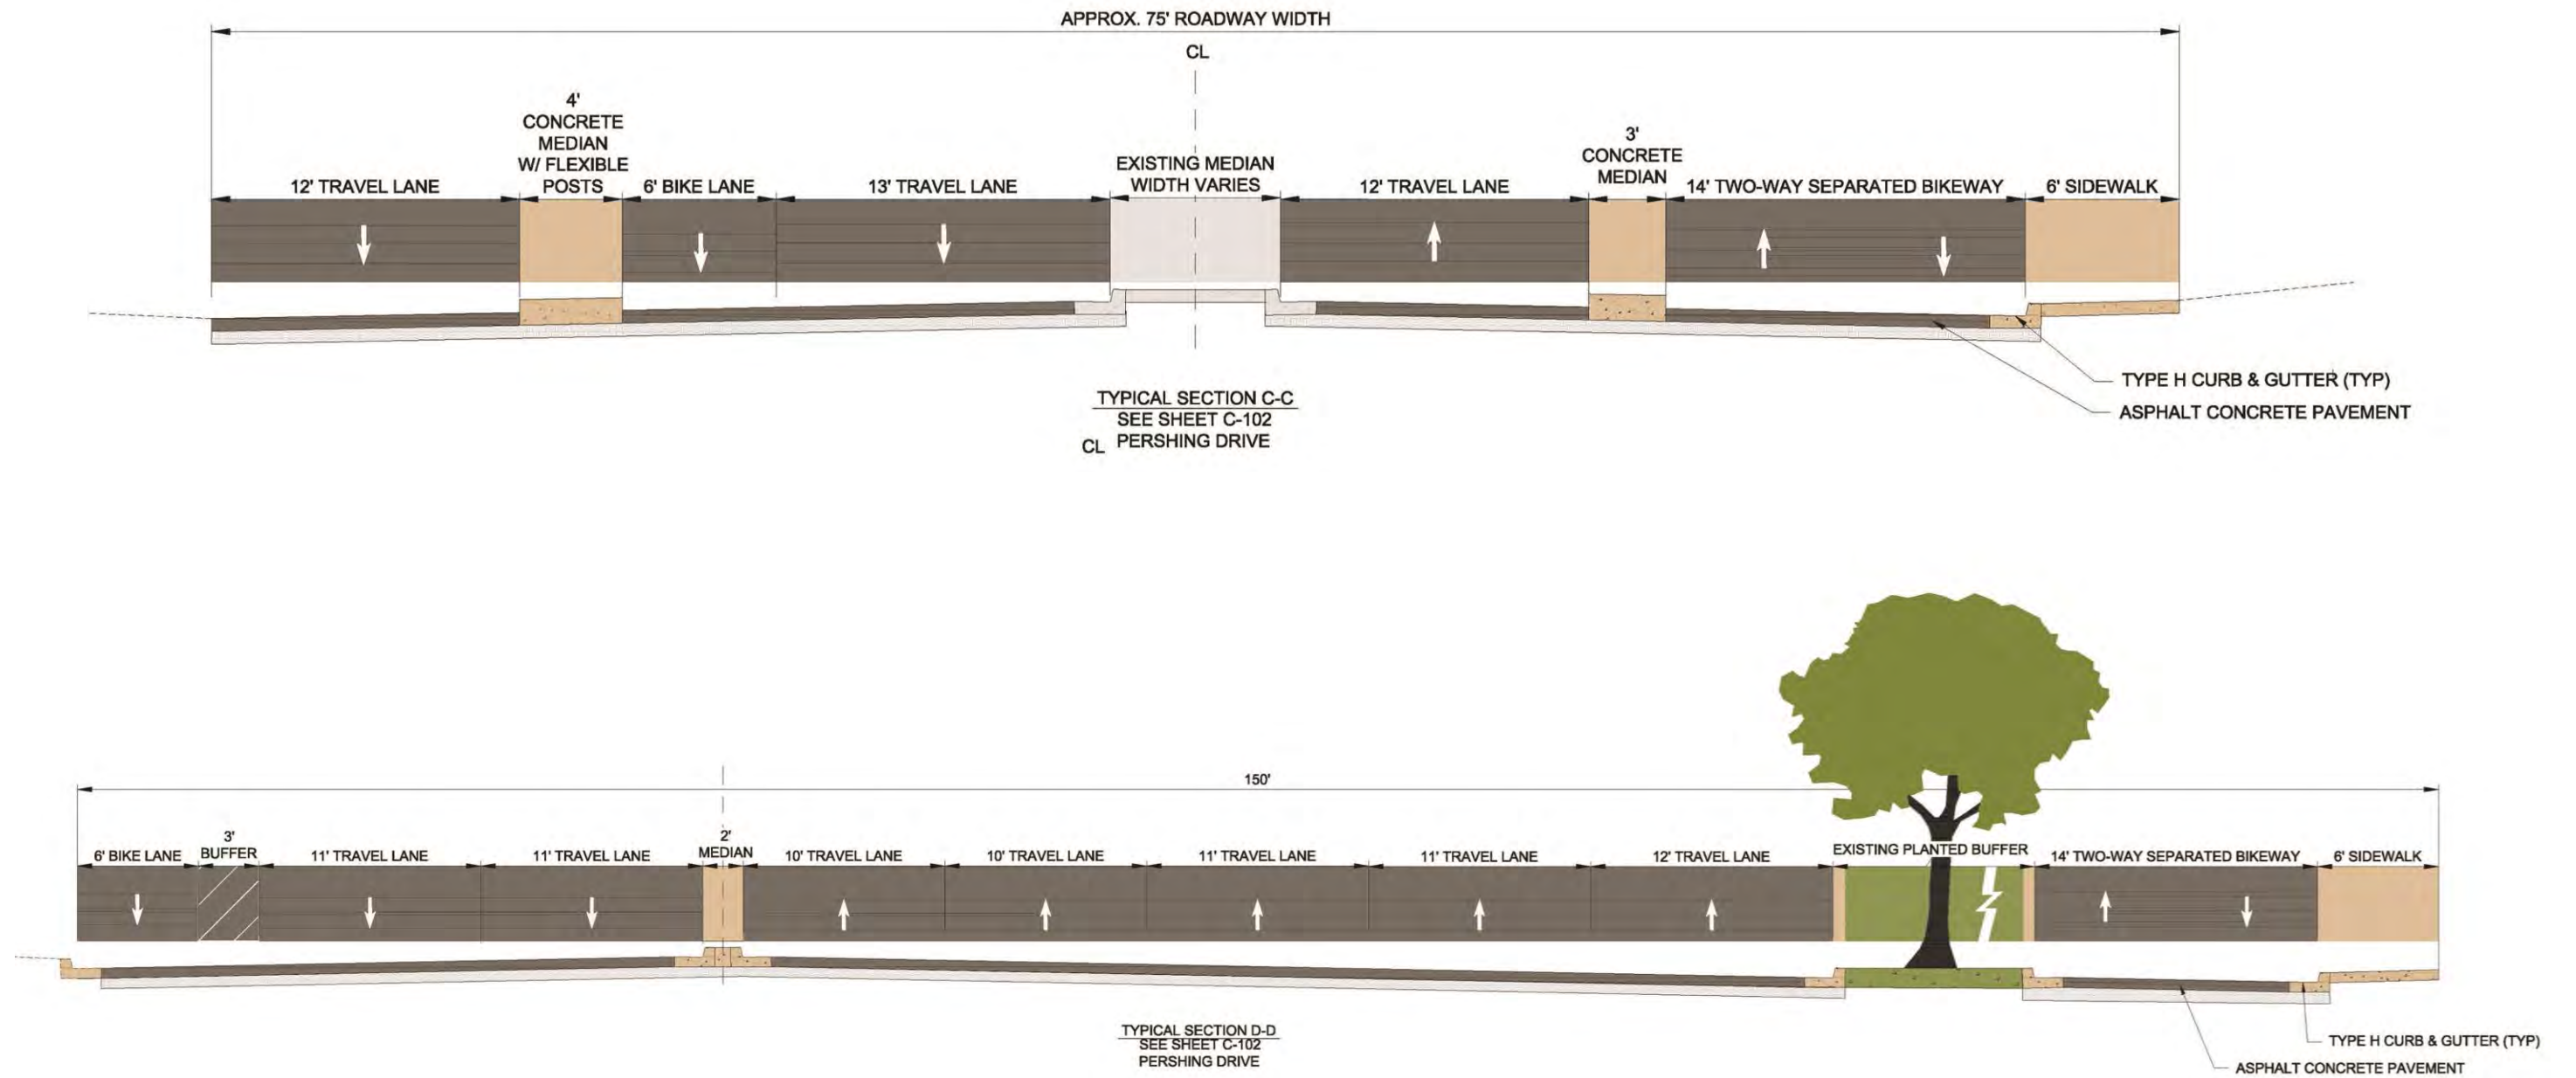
Typical Cross Section on Pershing Drive between Florida Drive/26th Street and Redwood Street (NB)
